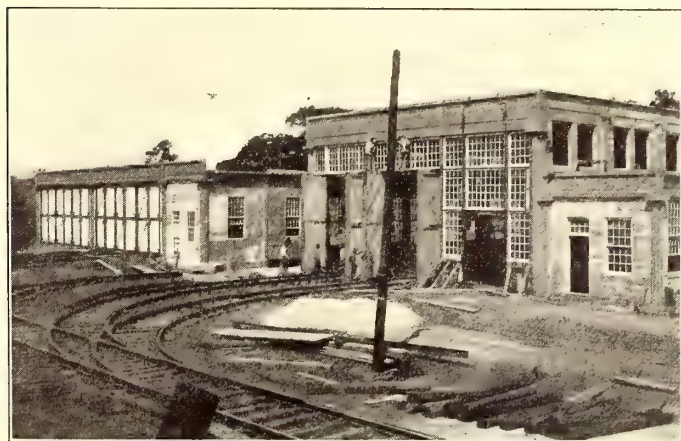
PUTTING ON THE FINISHING TOUCHES ON THE FRONT OF THE BUILDING
